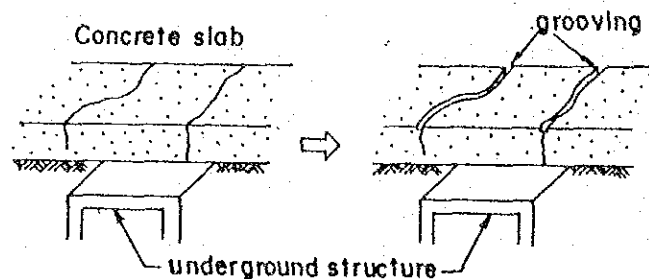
Repair of Cracking Around the Underground Structure
